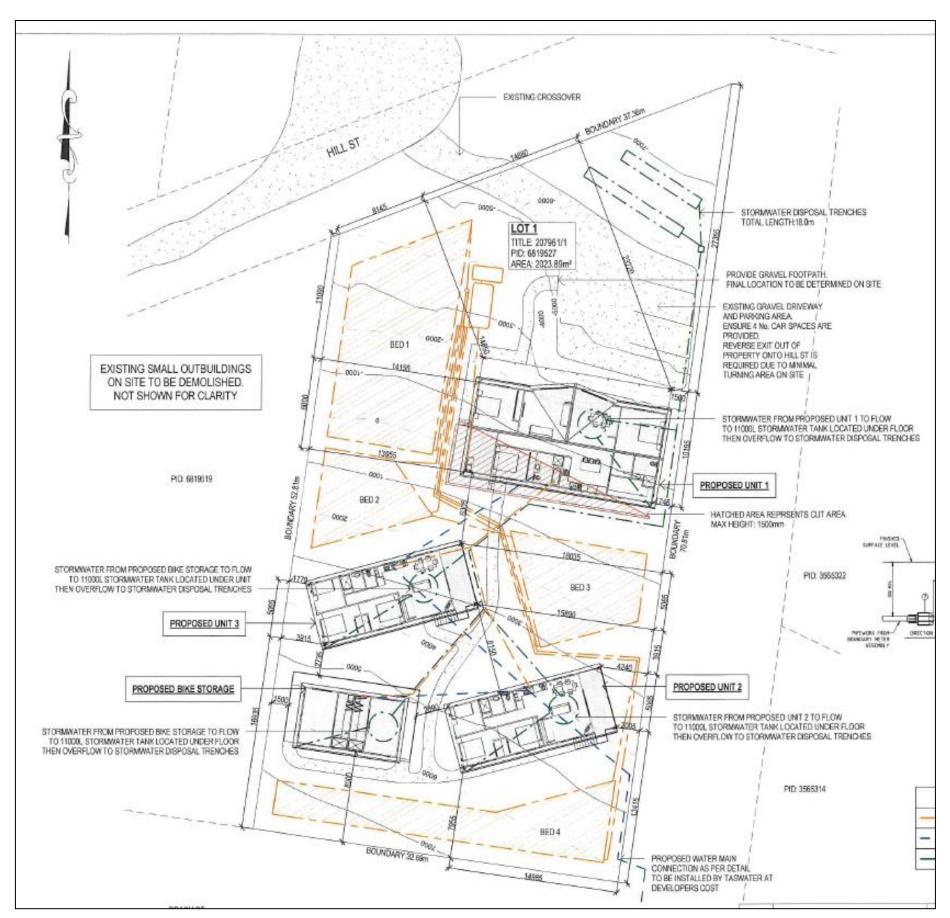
Site Plan of Proposed Visitor Accommodation (3 Units) and associated outbuilding (source: Ms L Trimmer 2019)
